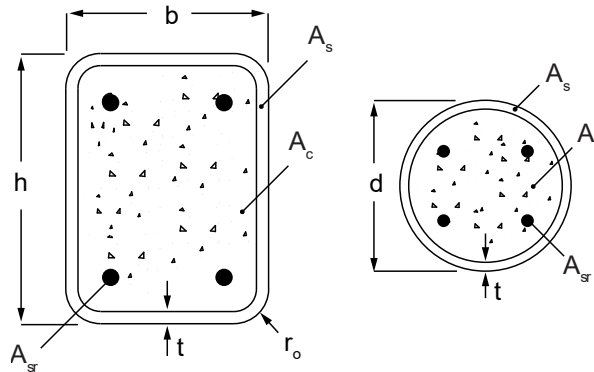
Cross-section layout for compressive resistance according to AISC 360-16: (left) Concrete-filled RHS; (right) Concrete-filled CHS
